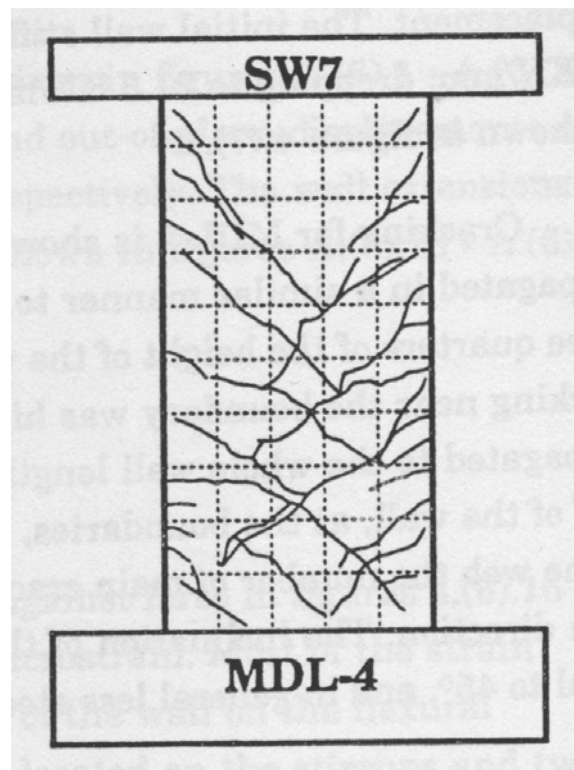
Condition of wall SW7 at 0.33% drift [Pilakoutas (1991)]
